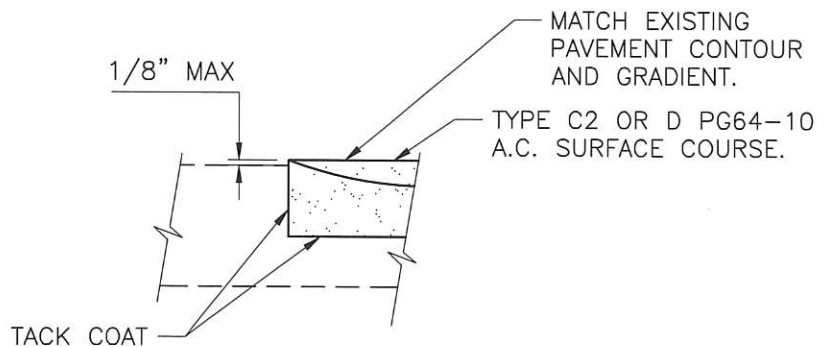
DETAIL FOR TRENCHING, BACKFILL & PAVEMENT RESTORATION
